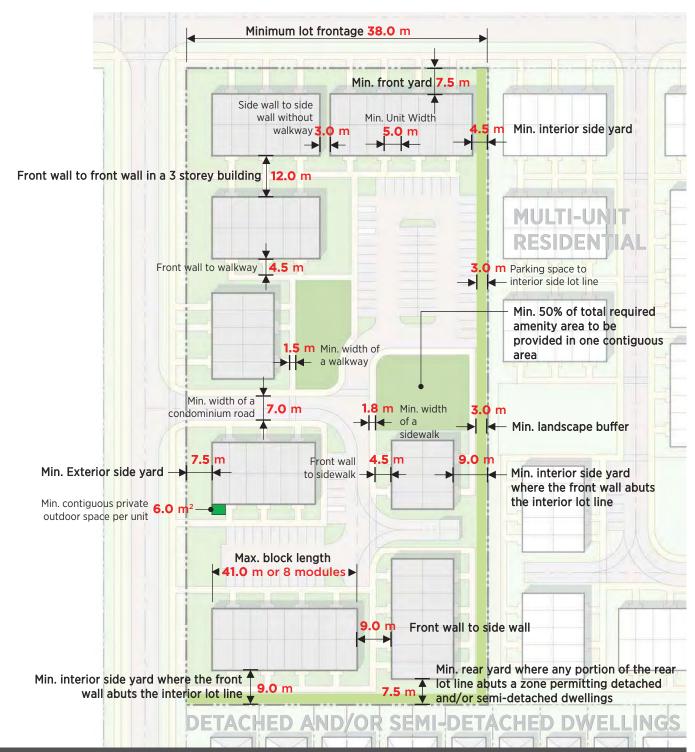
Standard Dimensions for Back to Back Townhouses (RM11). For Additional Standards refer to the Zoning By-Law.
